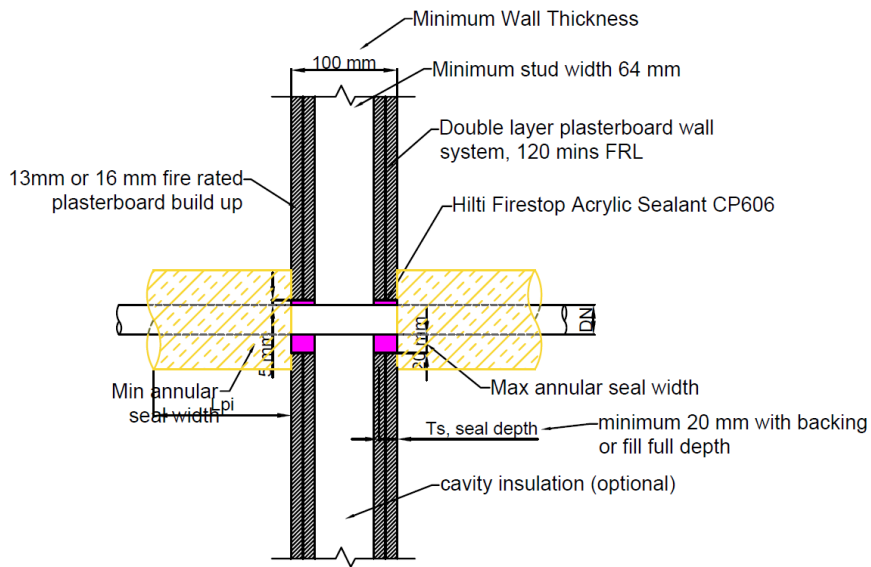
Side view – 120 mins FRL plasterboard system with or without mineral stone wool
